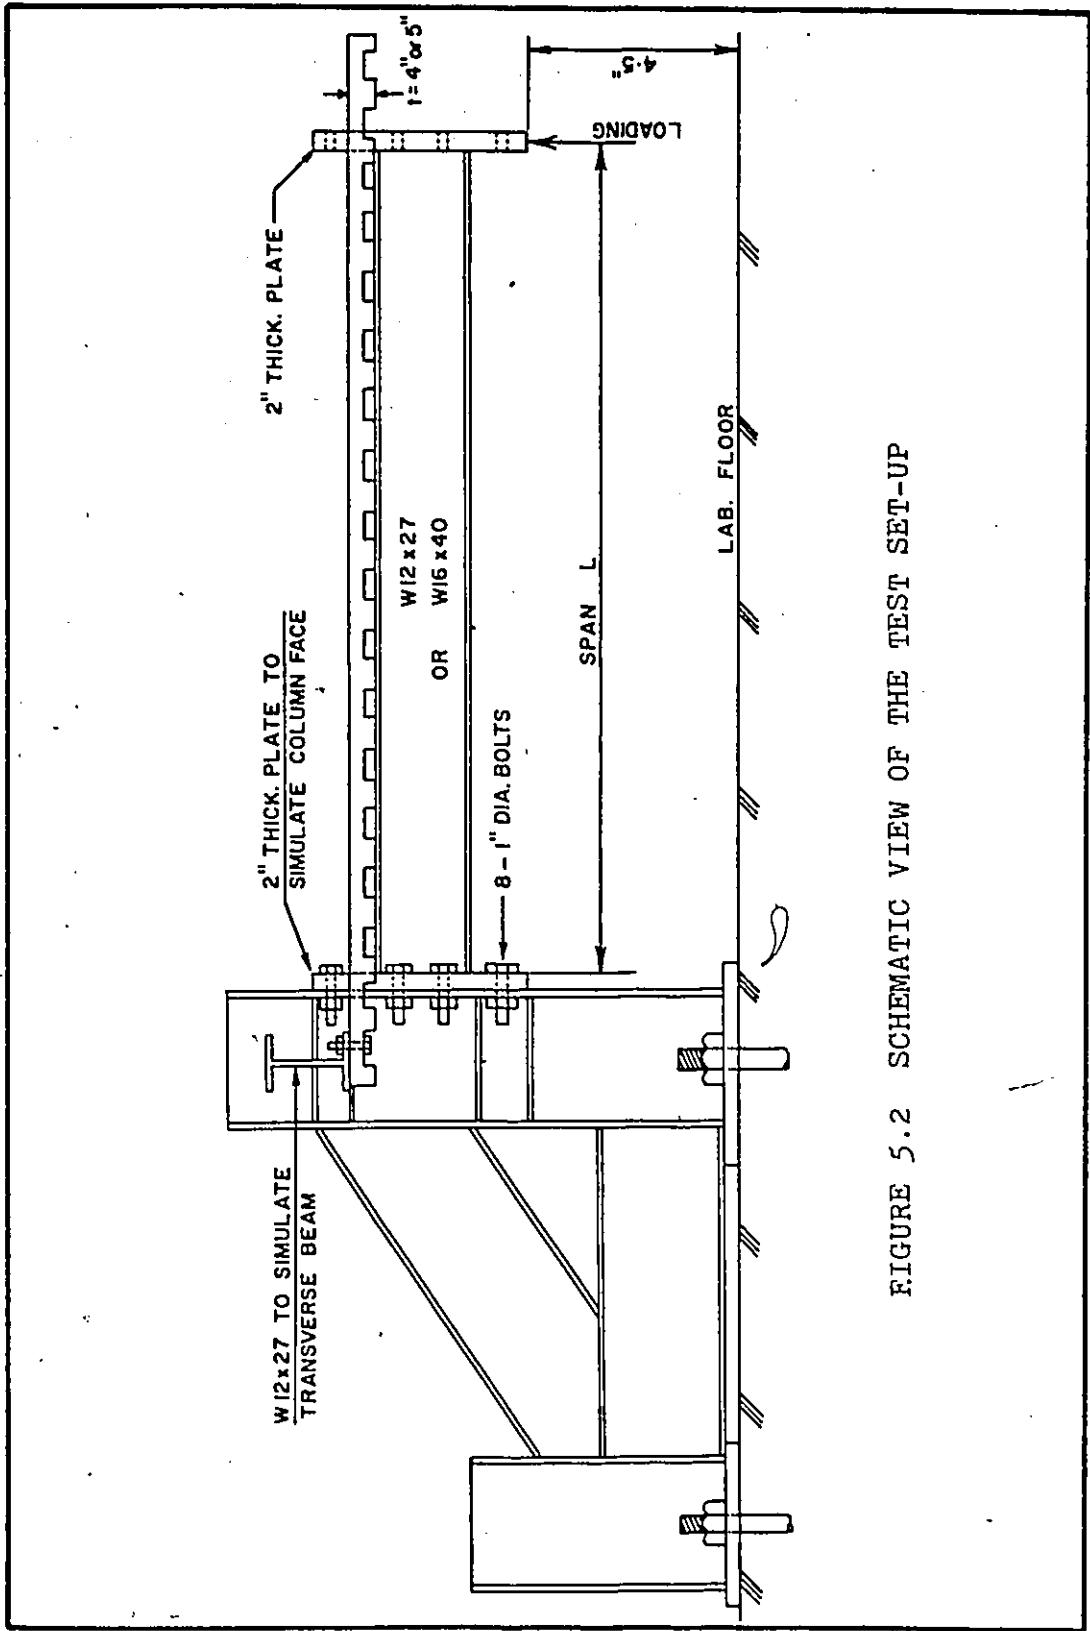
SCHEMATIC VIEW OF THE TEST SET-UP
